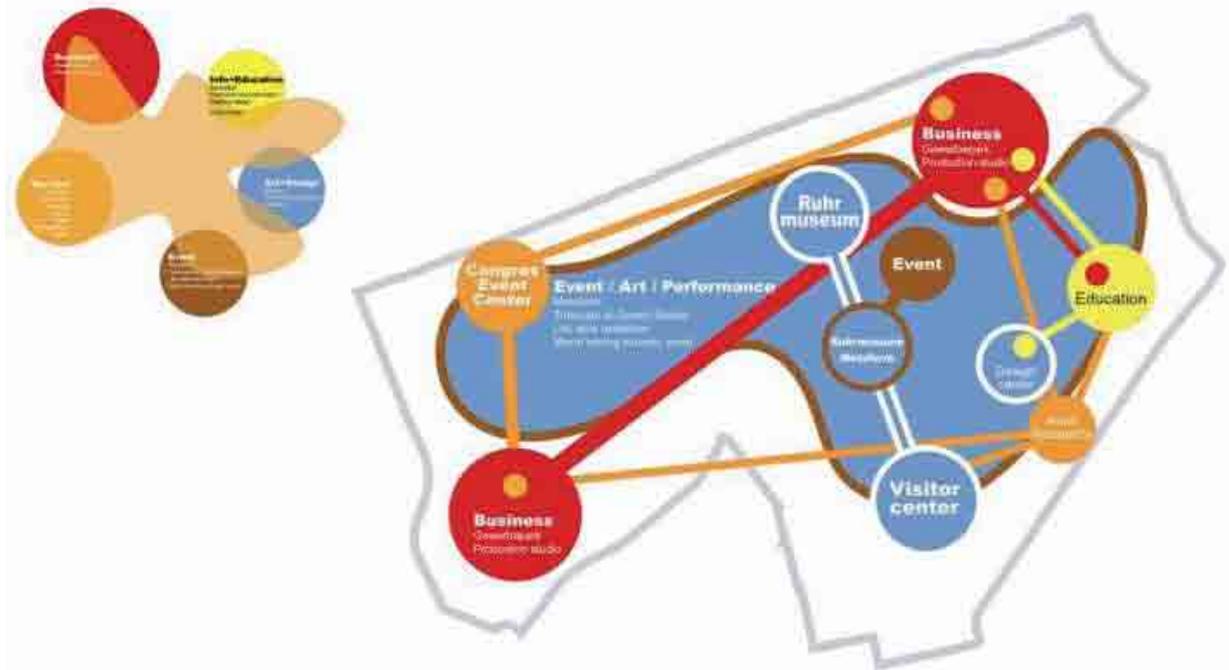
3: Zeche Zollverein, masterplan: The Walled City (Design: OMA)
